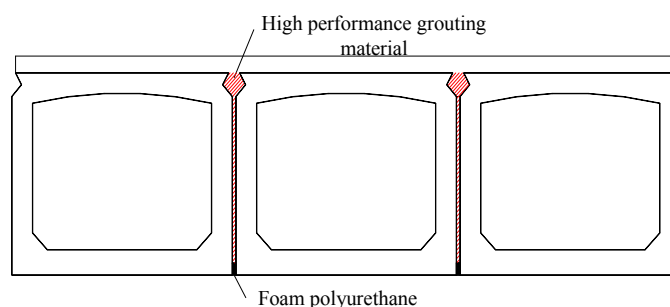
Schematic diagram of the construction of high performance grouting material Layout of text
